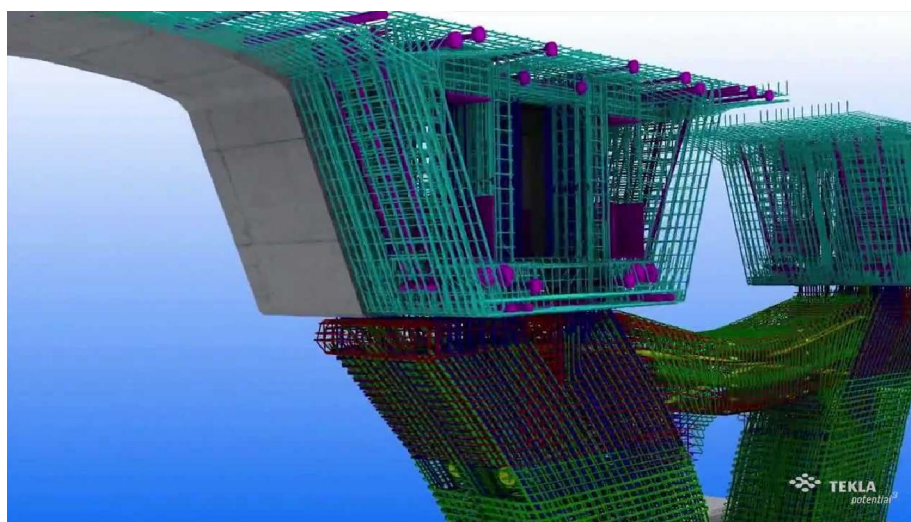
BrIM detail: prestressed concrete box girder bridge segment (model by Tekla Structures [22]).
